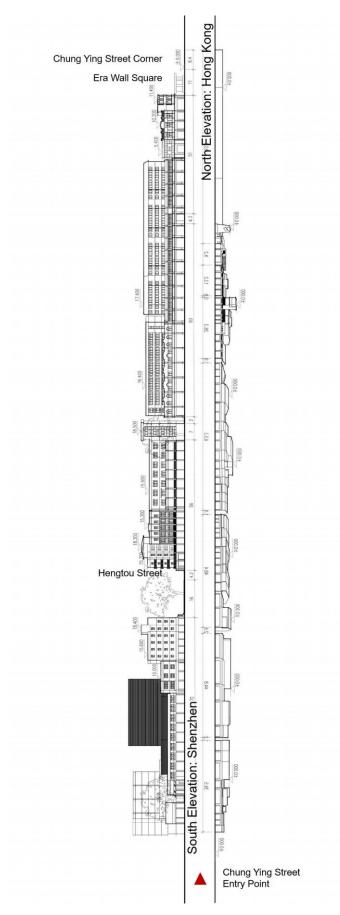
Elevation of the Street Walls of Commercial Street (Source: Drawn by the Author)
